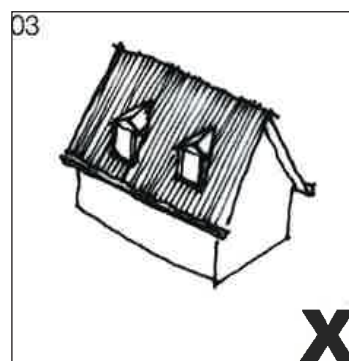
(m) Tiled roof forms are strongly discouraged.(l)
